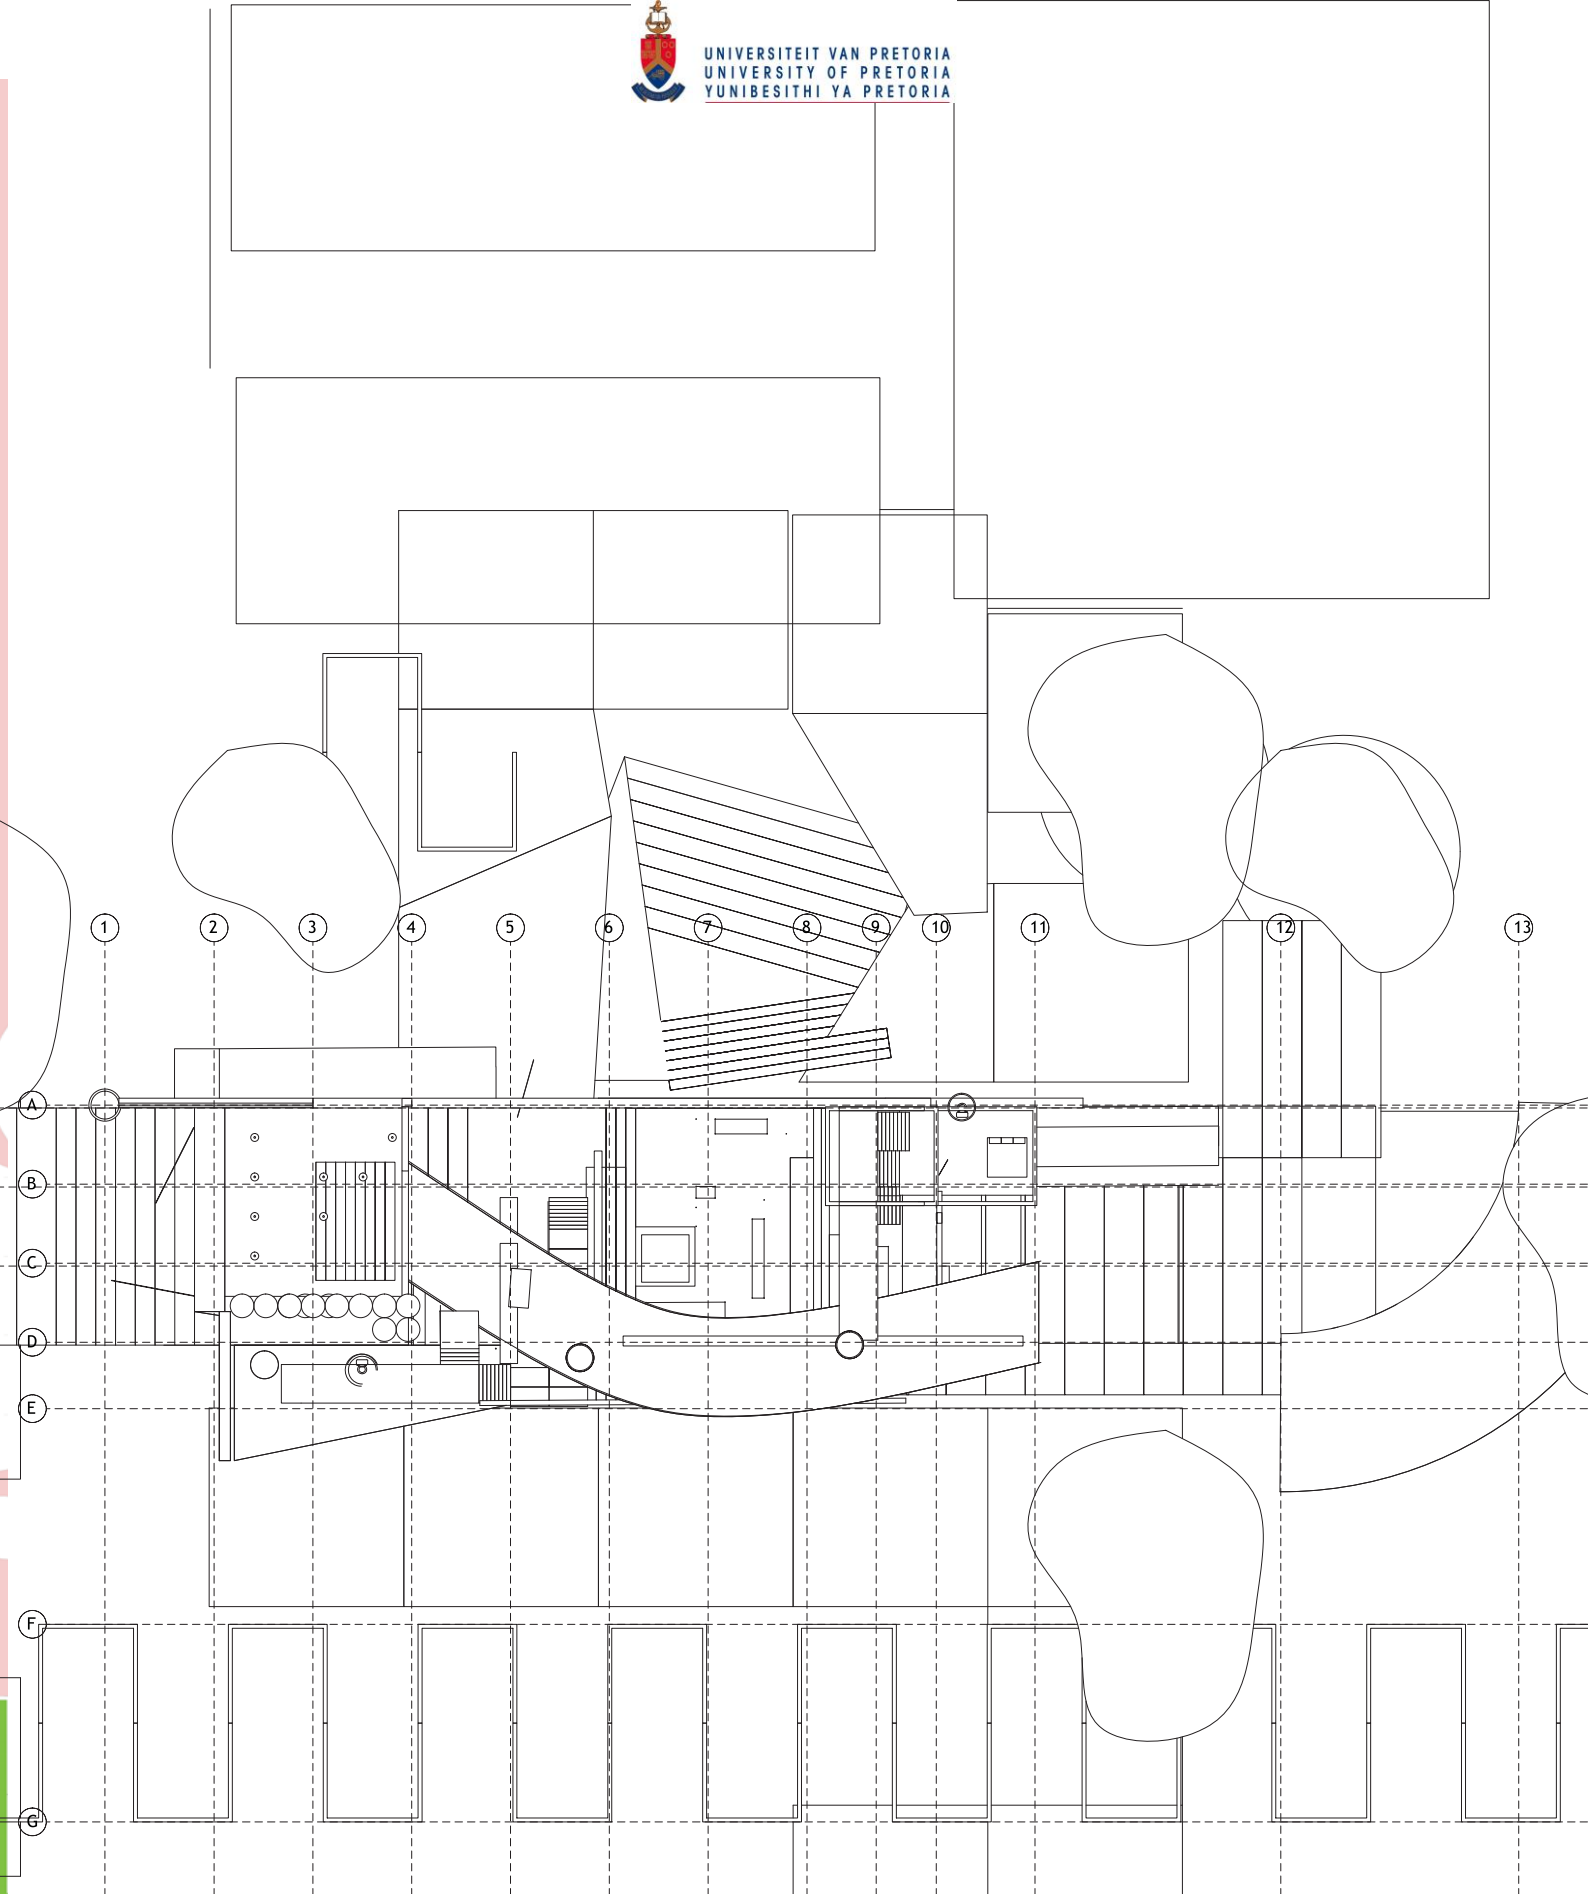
Plans of site and plans of the top floor of hte building, in progress.
